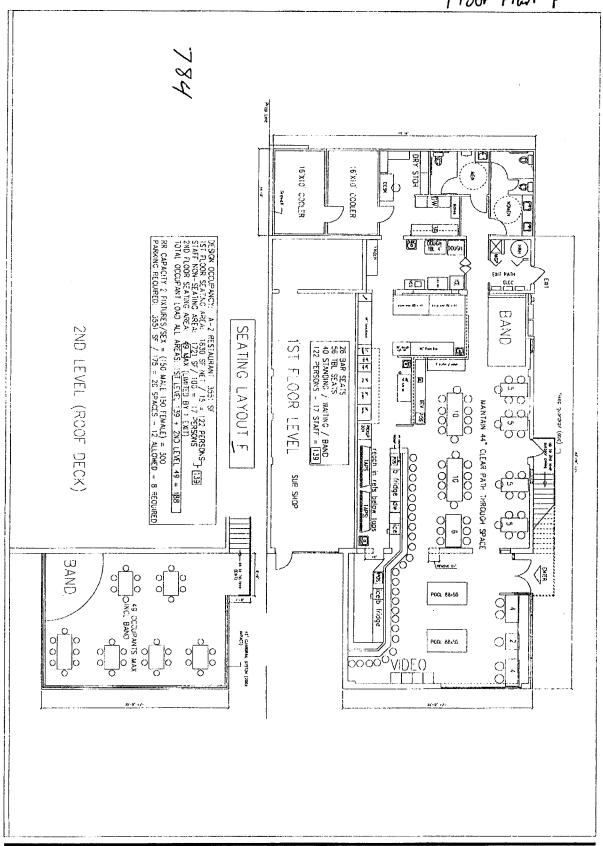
Exhibit A - Floor Plan(s) Worksheet - Floor Plan F (lotanial for 2 hards)
